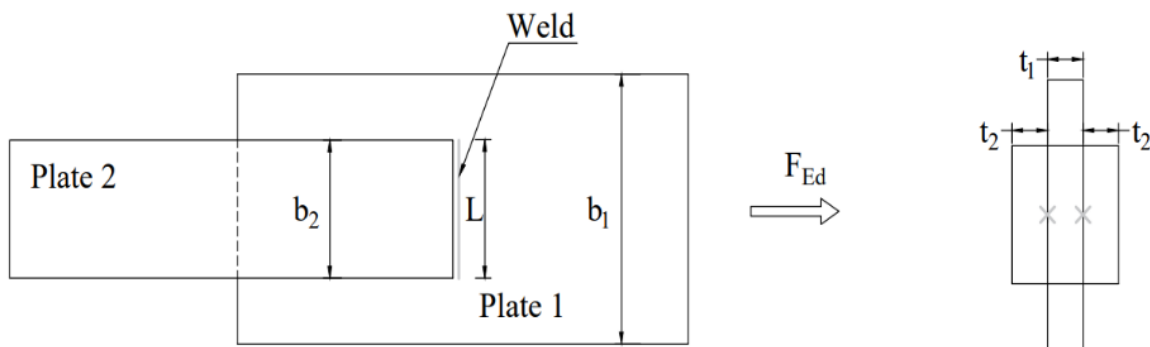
Geometric configuration of fillet weld transverse weld.
